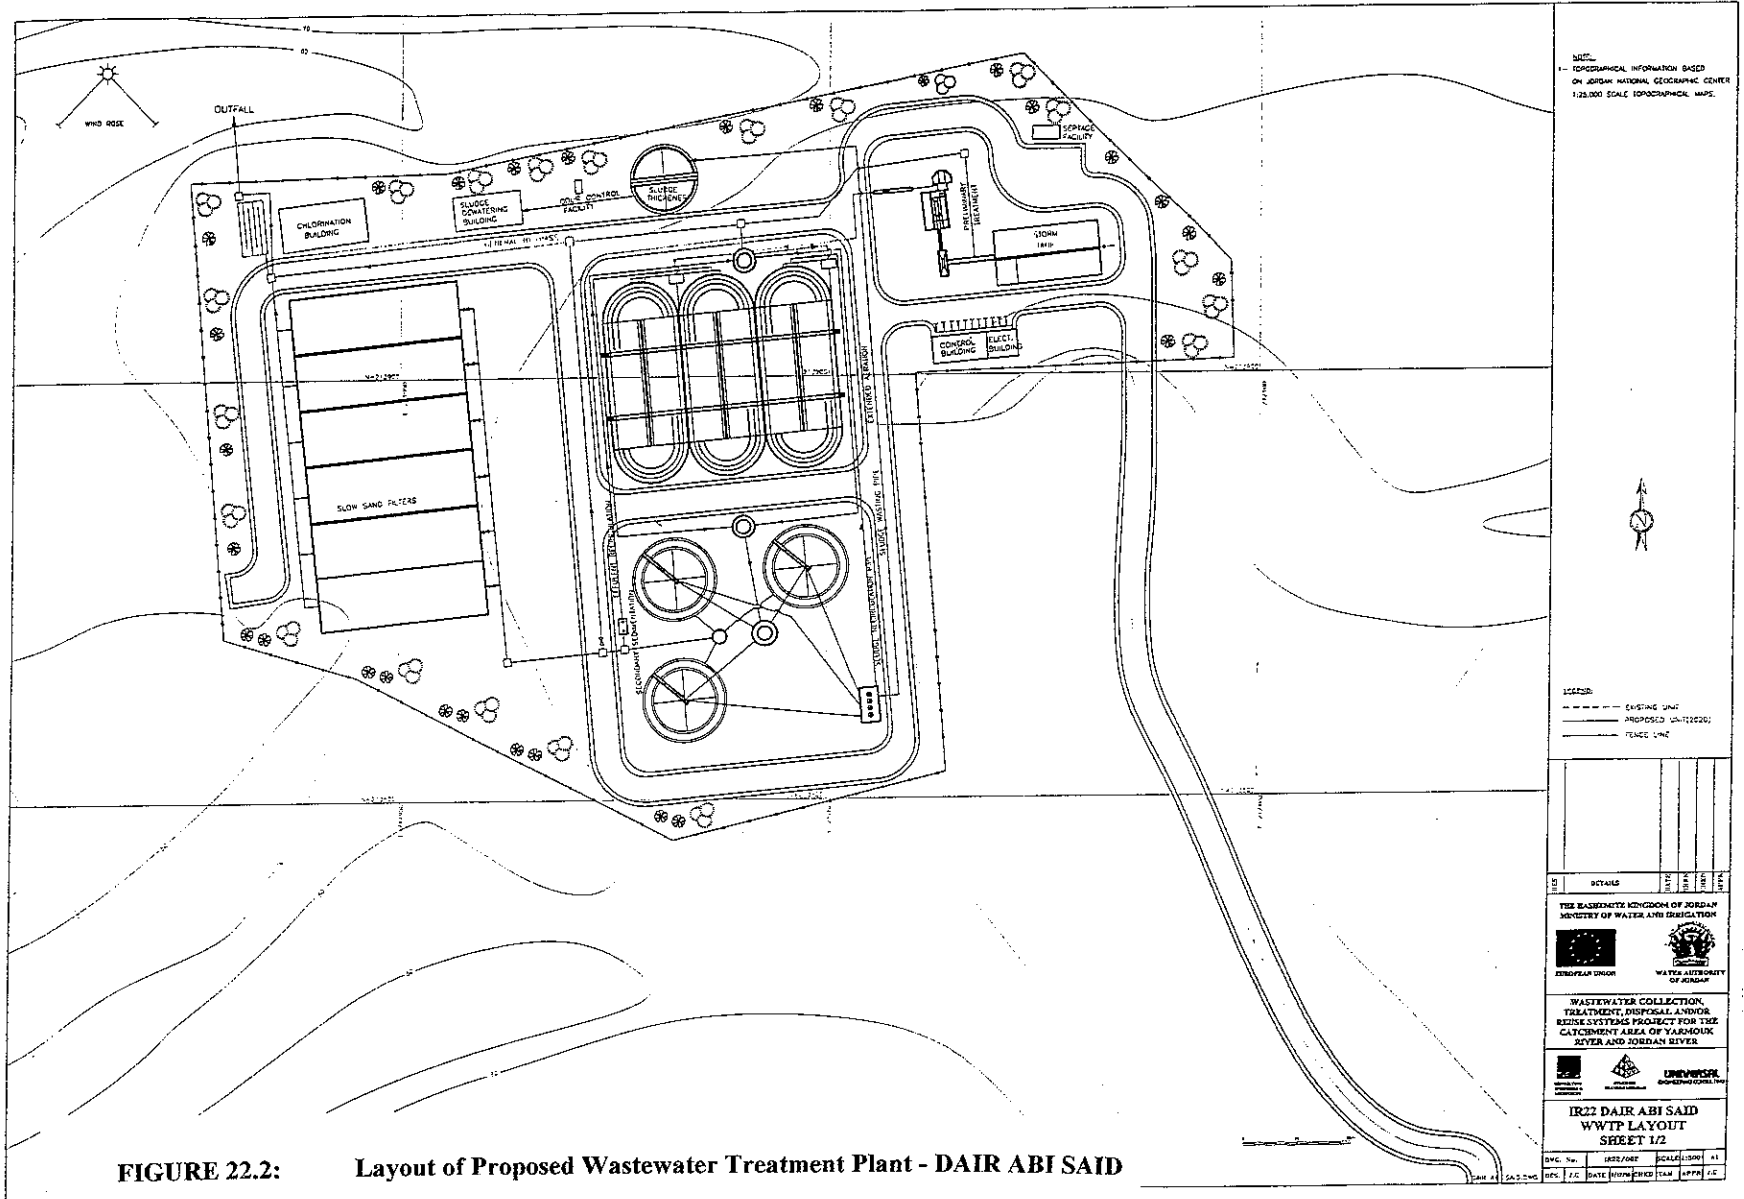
Layout of Proposed Wastewater Treatment Plant - DAIR ABI SAID
